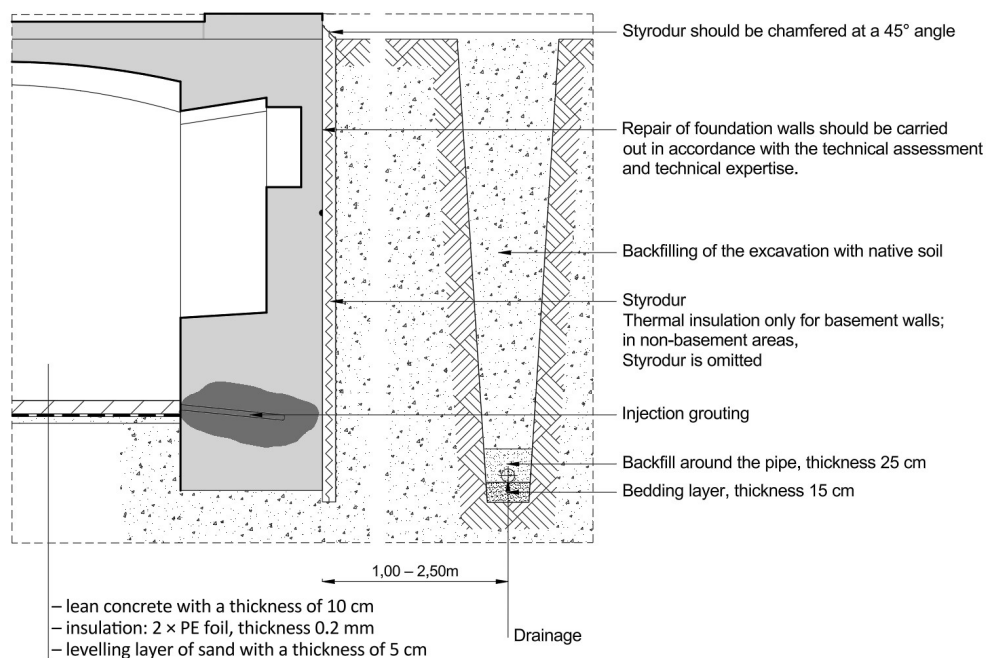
Diagram of works at the foundation walls. Own elaboration
